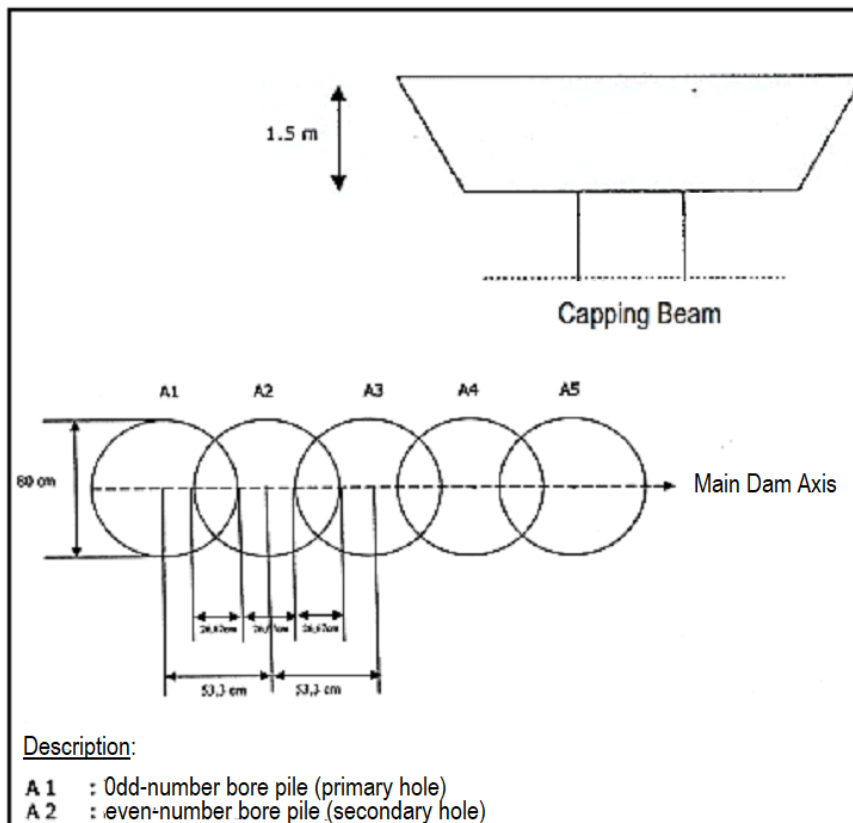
Lay Out of the Cut Off Wall with Bore Pile
